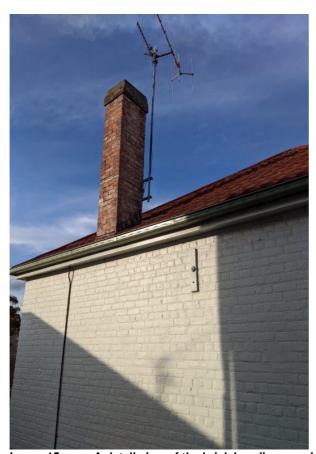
A detail view of the brick bonding consisting of three stretcher courses and one header course which is known as Flemish garden wall bonding. Note the damaged brickwork in the chimney flue. Restoration of the brickwork and re-pointing will conserve the two chimneys.
